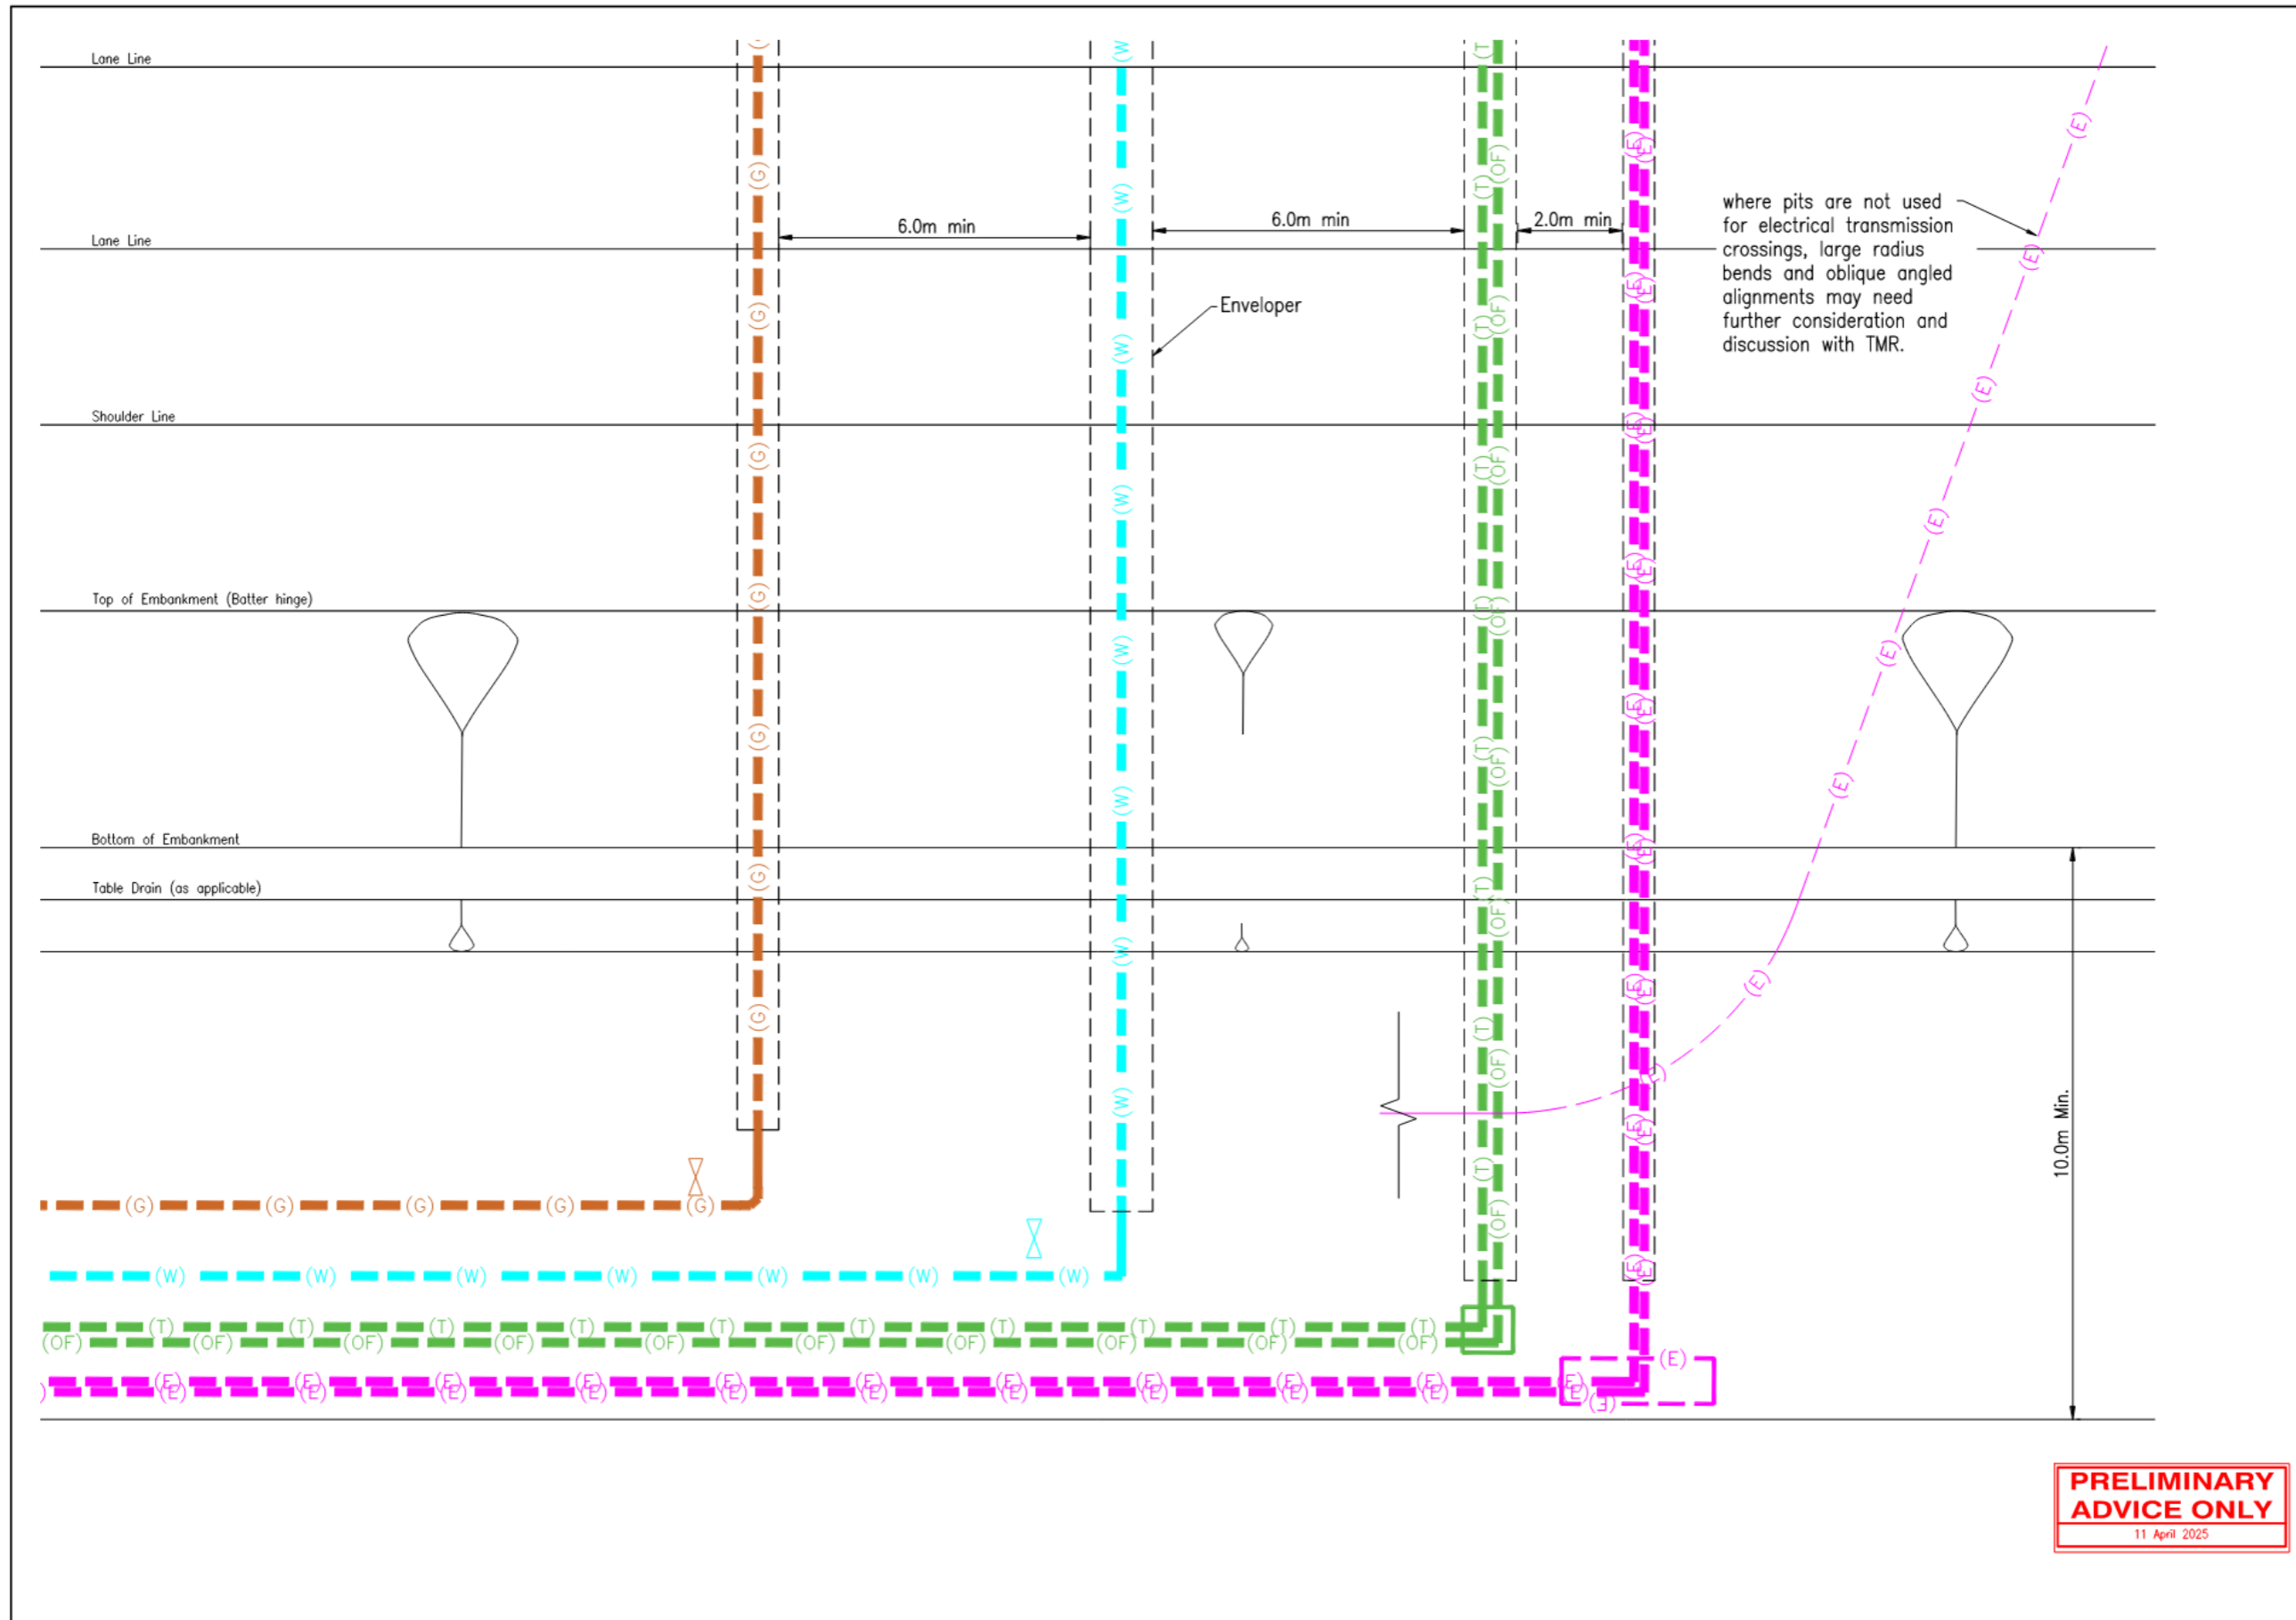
(b) – Typical service crossing offsets plan
